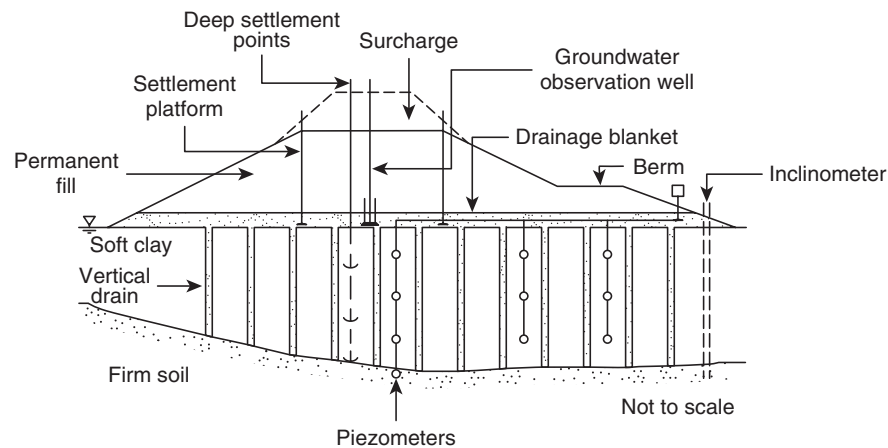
Prefabricated vertical drains for a highway embankment.
